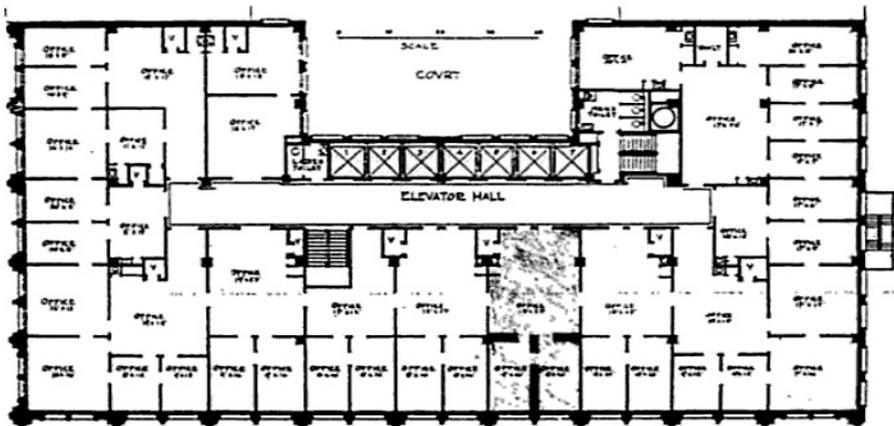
Typical plan of skyscraper structure, with offices located on perimeter, in order to gain maximum light. Service core placed in center of plan.
